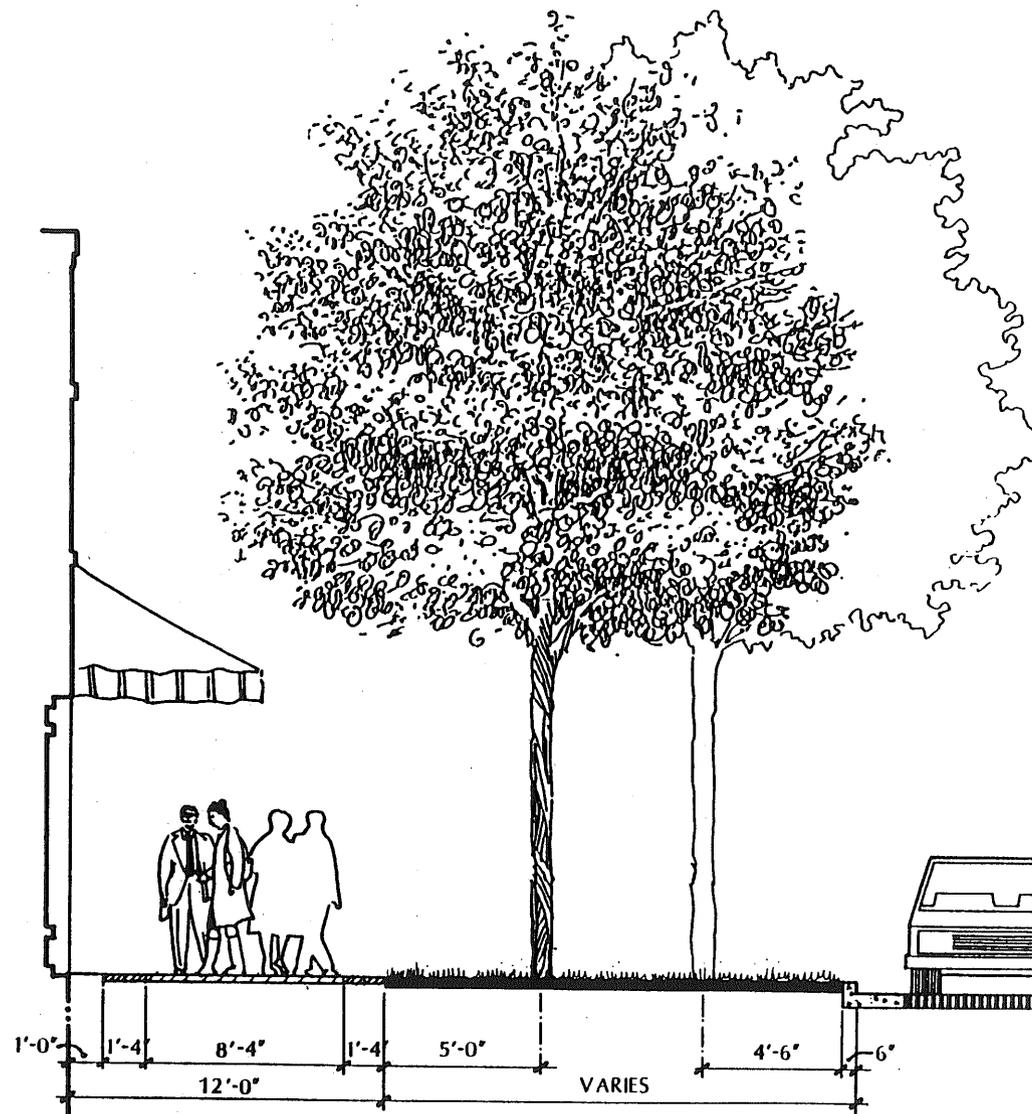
Courthouse Square "Retail Green" - Proposed Section
